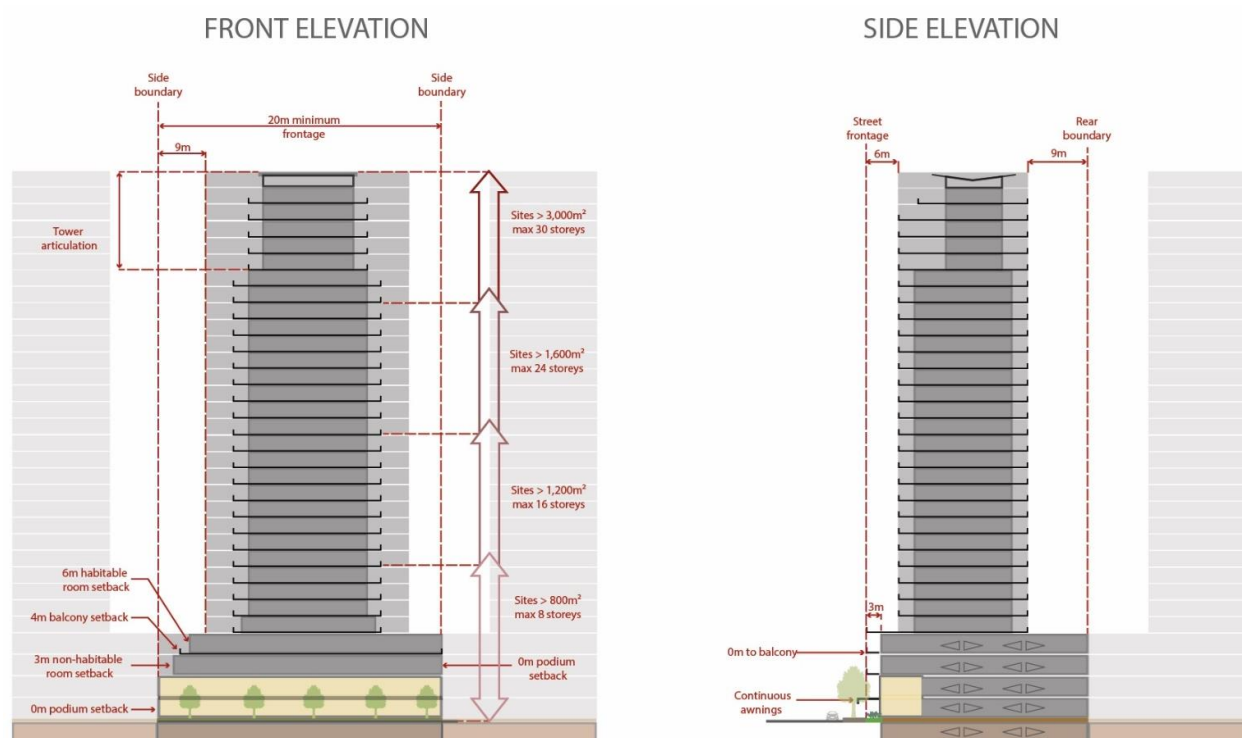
Built Height and Envelope Provisions – Mixed Use Zone
